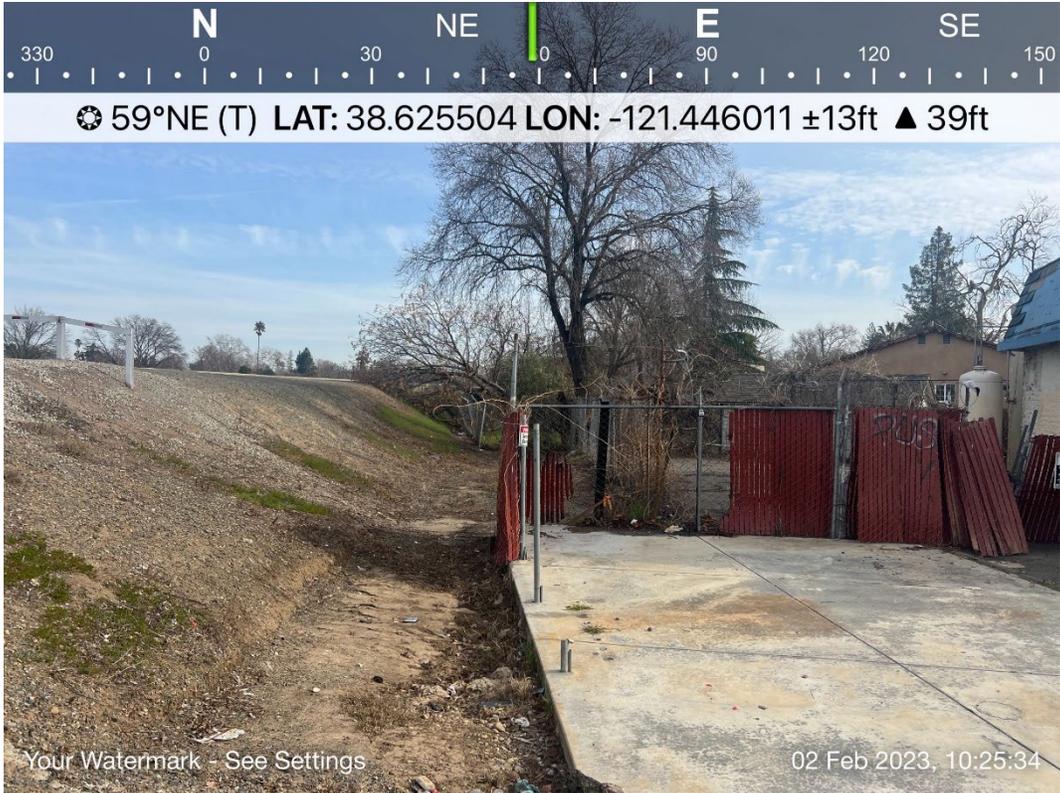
Project site from the northern end facing NE, Arcade Creek access road adjacent to the site
